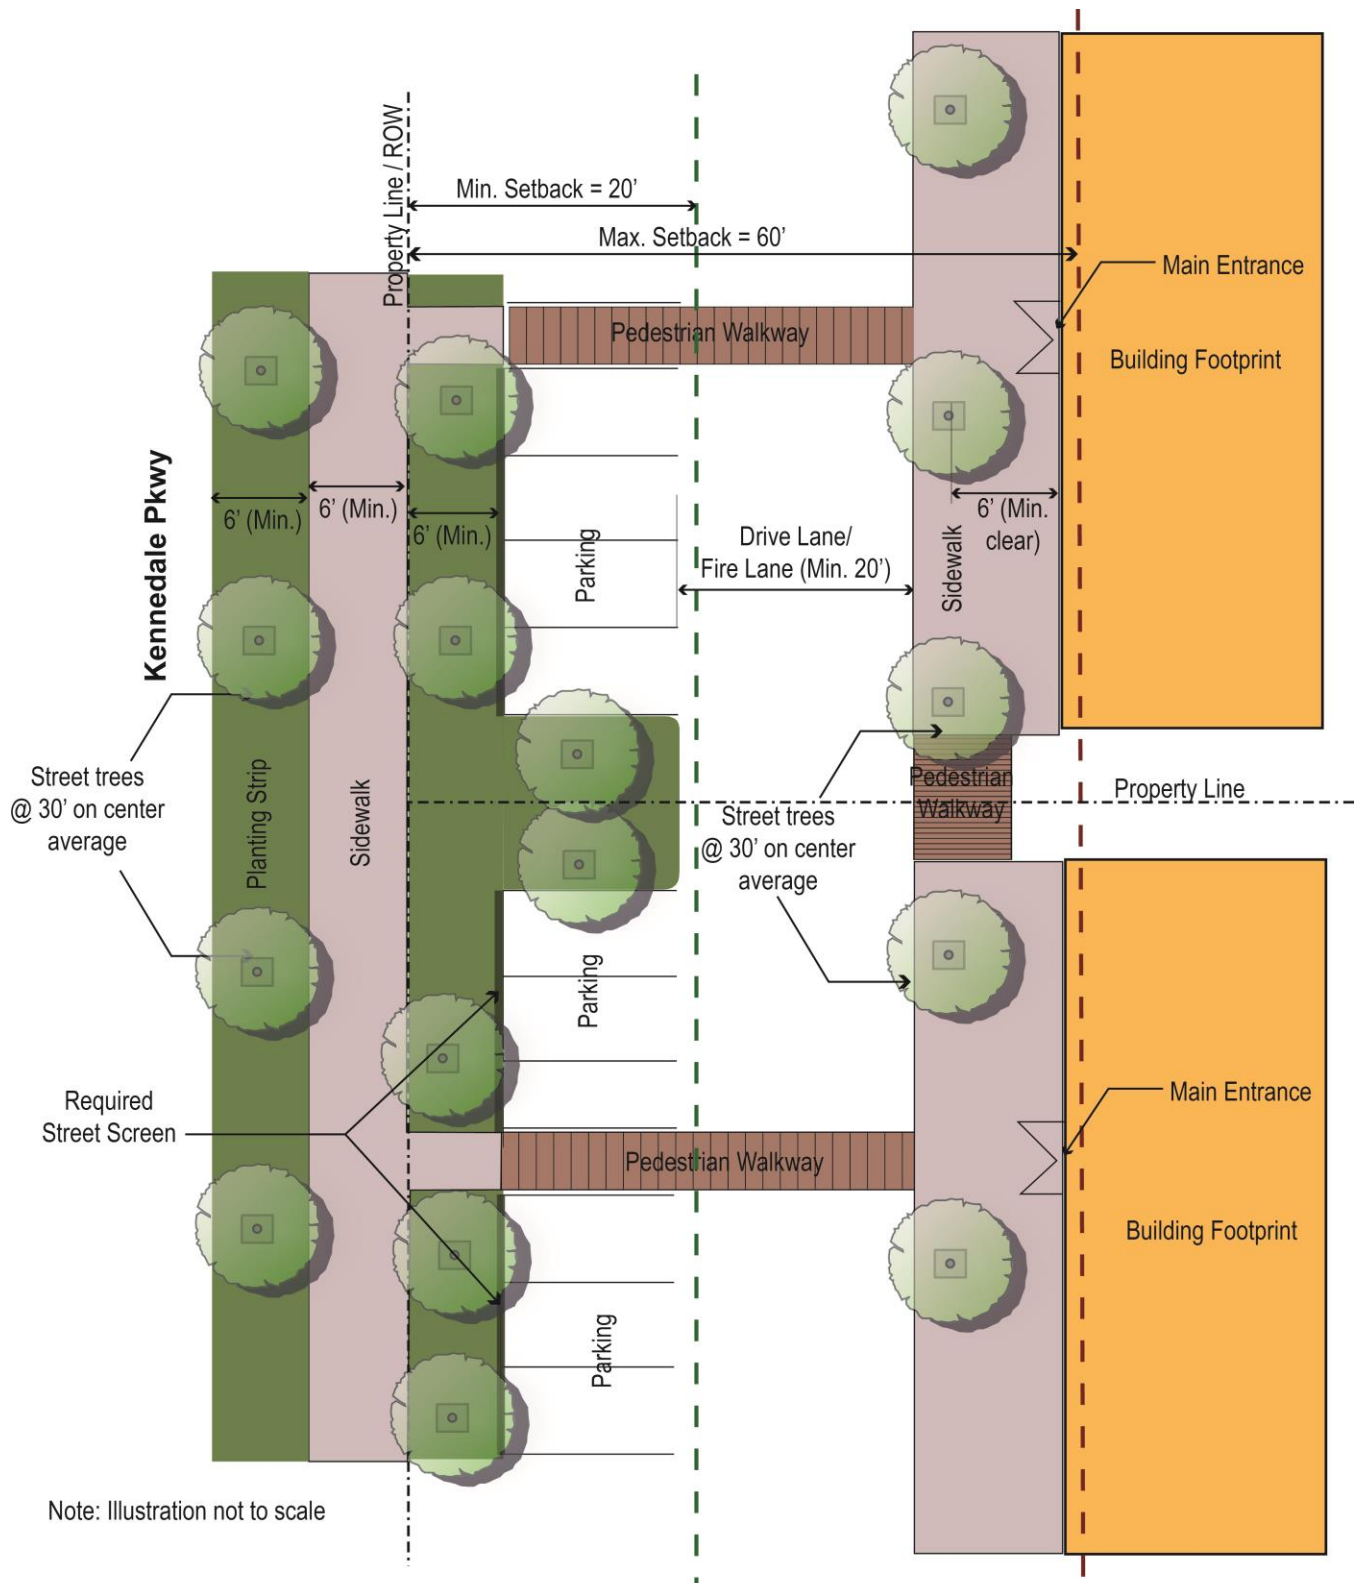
Example of parking area showing required streetscape and site design for properties along Parkway street type.
